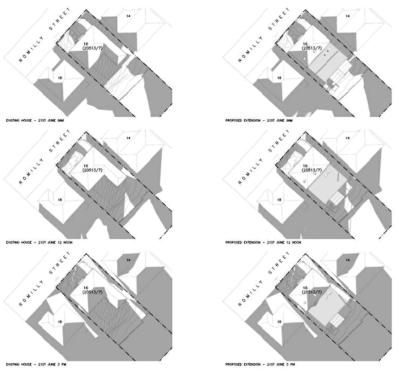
Existing and Proposed Shadow Diagrams (Steven Spizick Architect, 2021)
